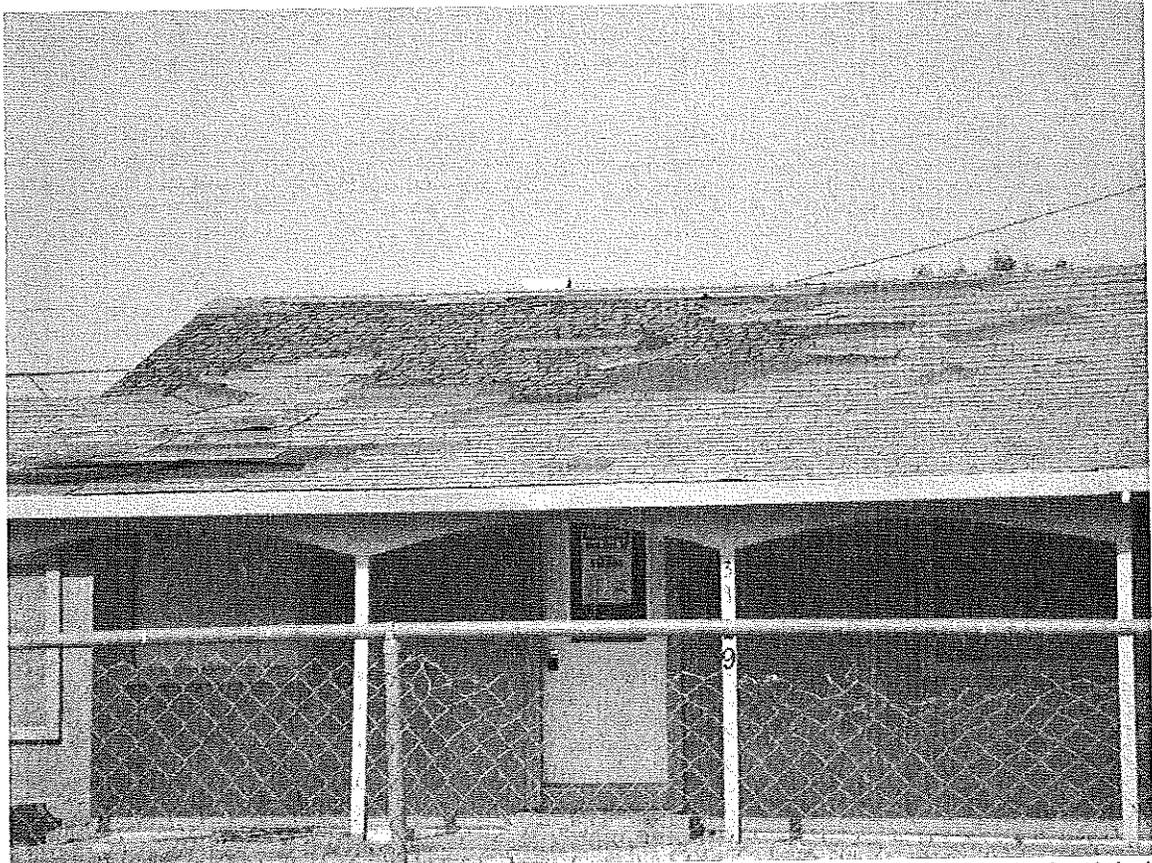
3900 Block of Fig Street, APN 251 0042 007: The roof at this boarded and uninhabited residence is damaged and peeling.
